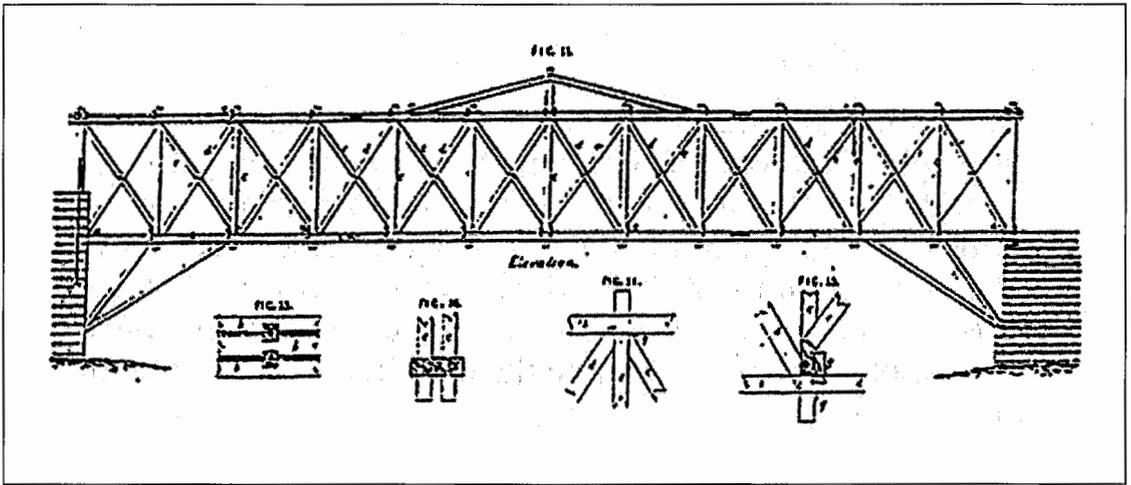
Long's 1830 Jackson Bridge with struts.
